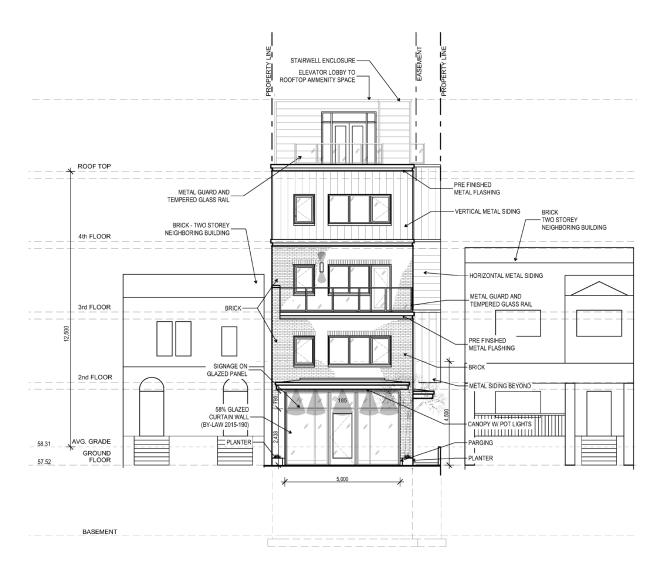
Proposed West (front) Elevation (Robertson Martin Architects)
